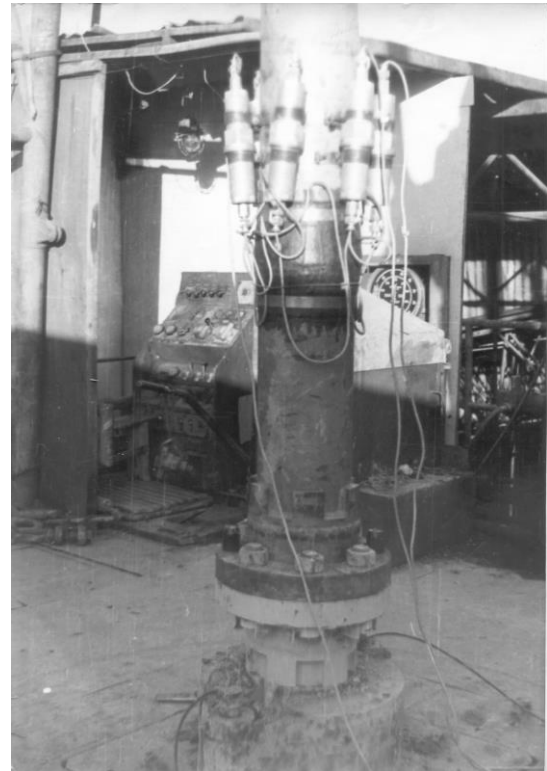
Stress captor assembled in the drill string, before lowering in the shaft.
